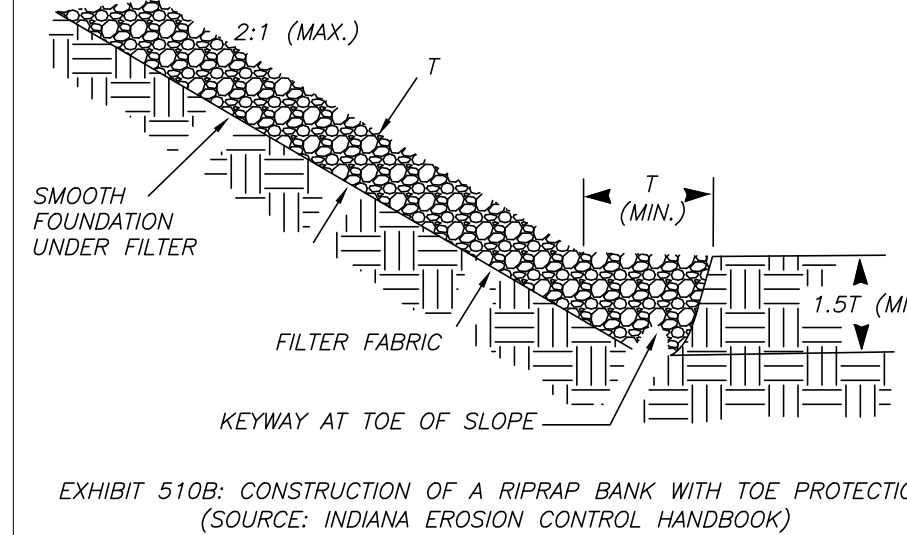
B: CONSTRUCTION OF A RIPRAP BANK WITH TOE PROTECTION (SOURCE: INDIANA EROSION CONTROL HANDBOOK)
